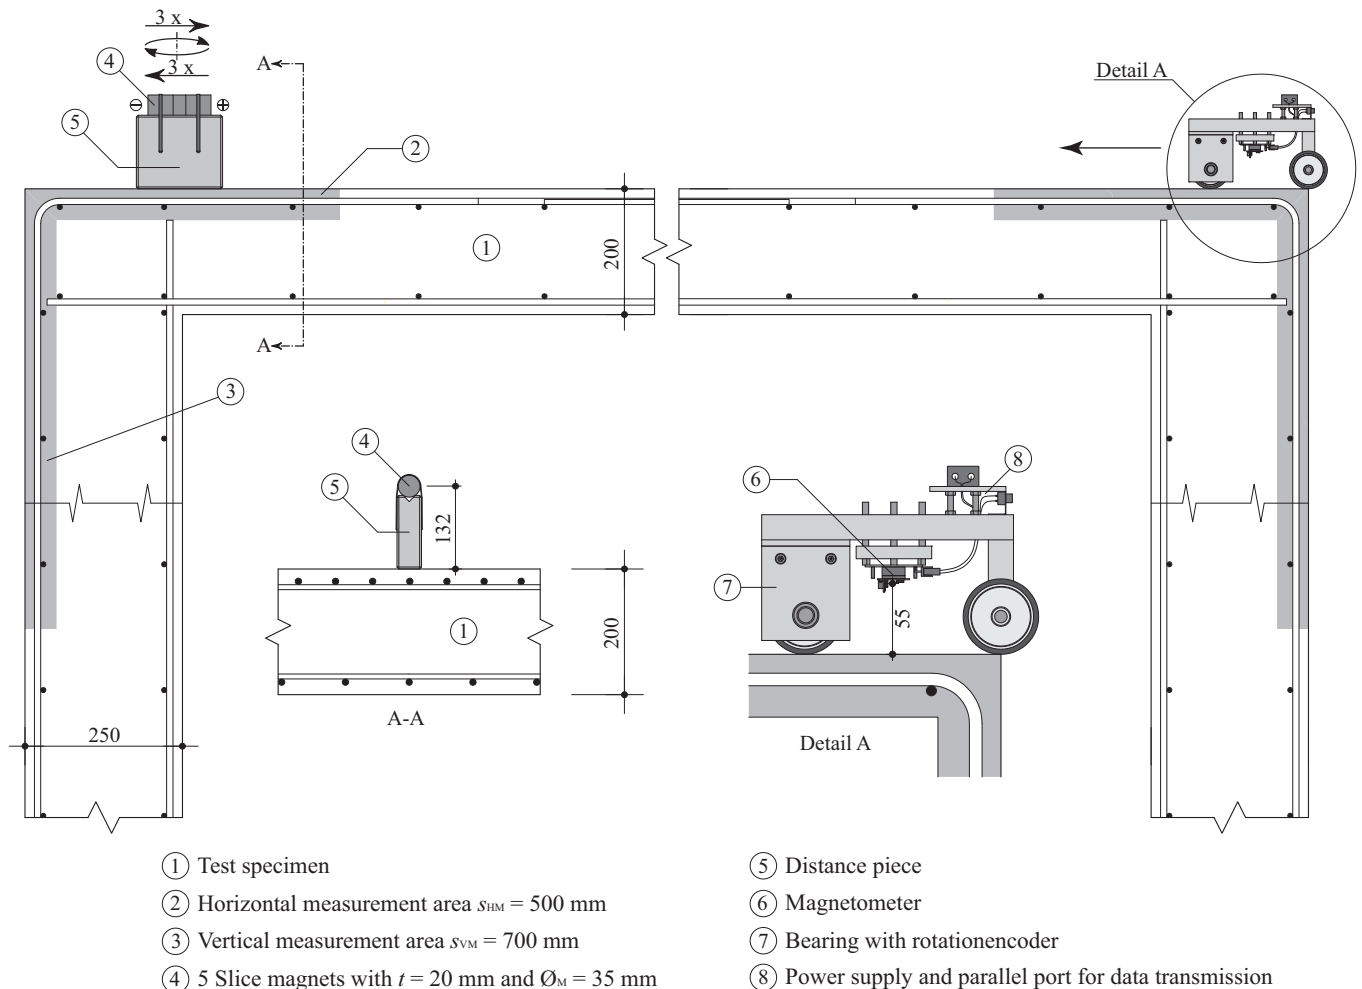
Sectional drawings of the frame with magnet and measurement vehicle.
